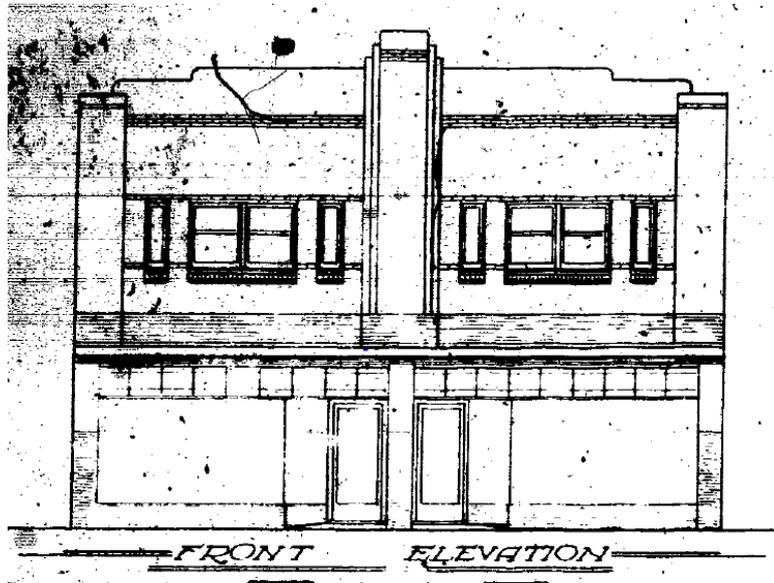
Architectural drawings for 237-239 High Street, which appear to show an earlier design for the building (Source: City of Camberwell building permit plans).
